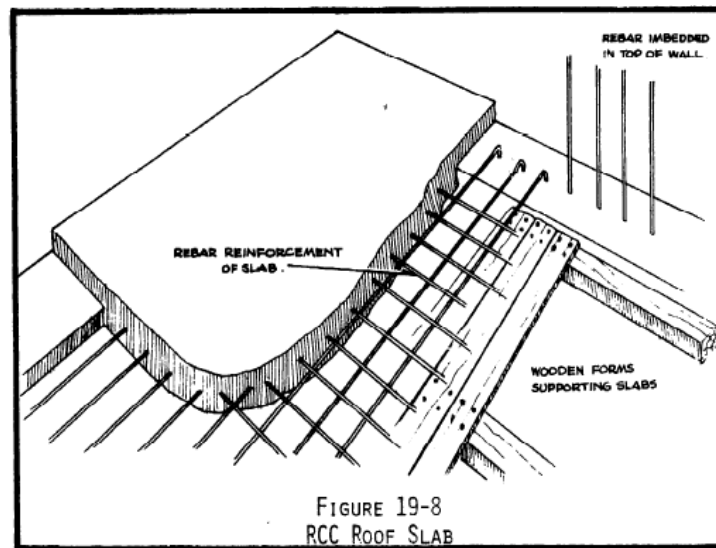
Image of Roof Slab Reinforced with Rebar [10]
